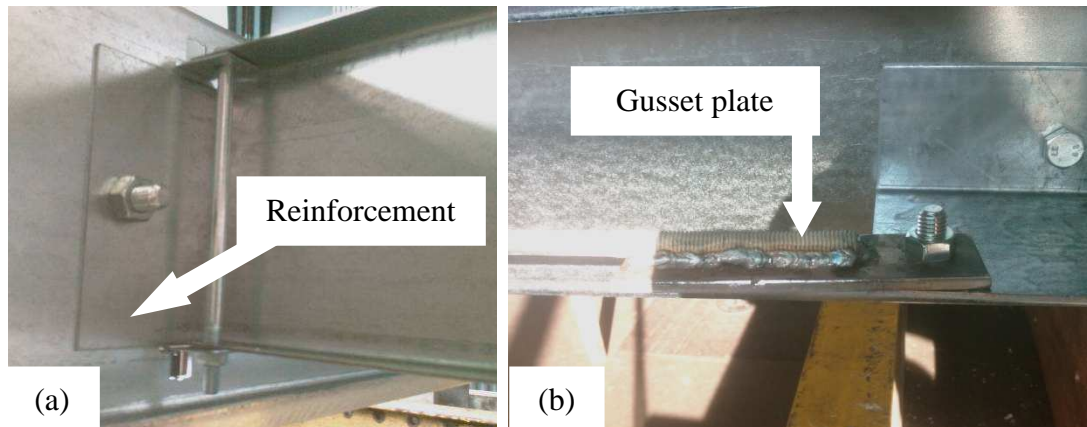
Improvements of the new structural arrangement: a) reinforcement plate, b) gusset plate at the end of the tie rod
